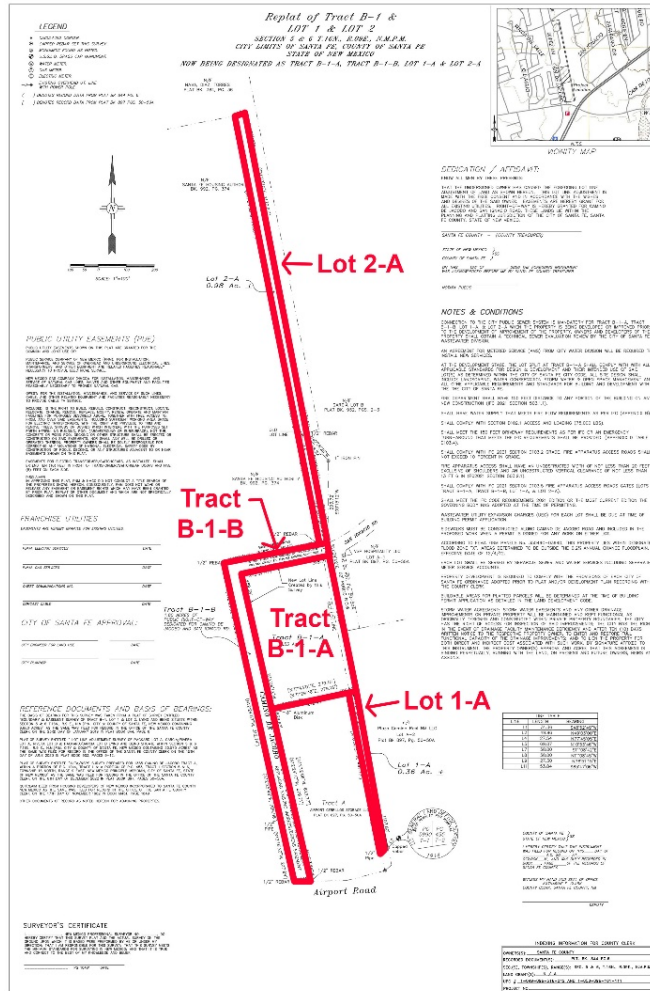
Proposed New Lot Line Adjustment and Consolidation
